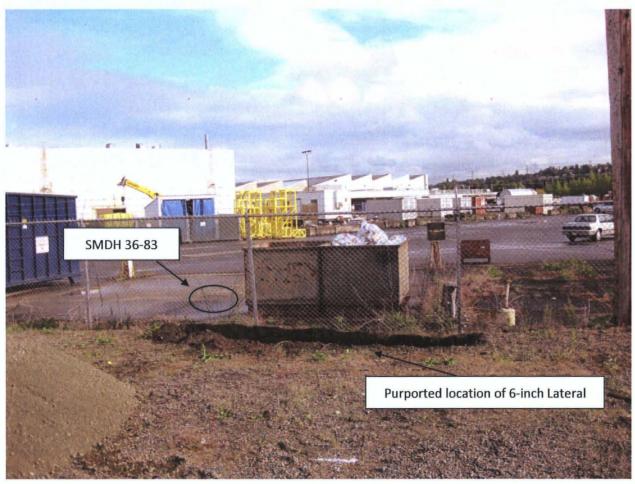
6-inch Lateral Excavation Facing North toward SDMH 36-83
